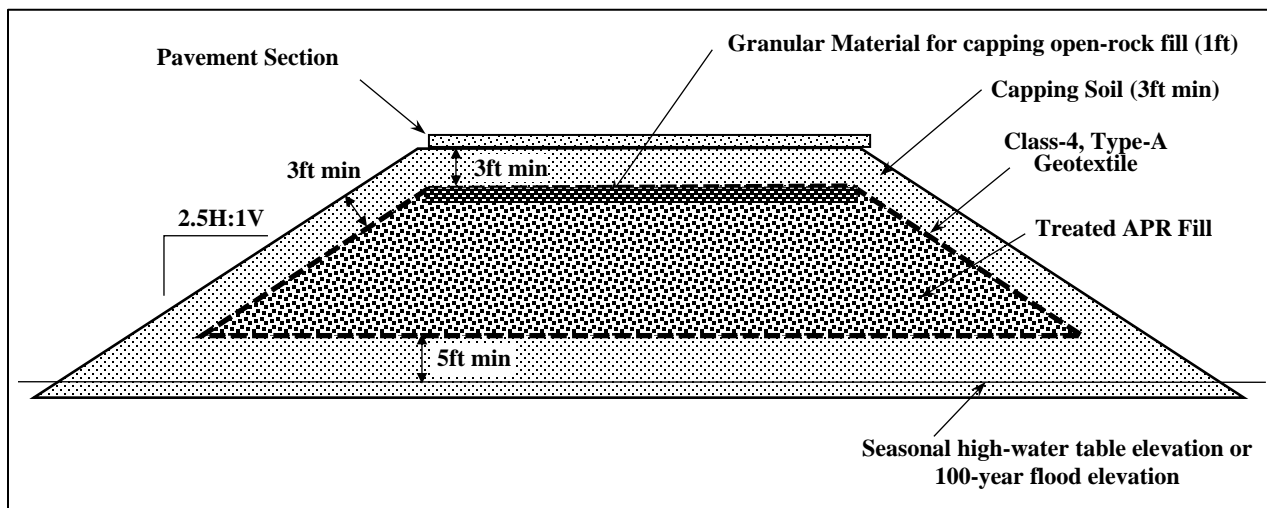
Typical Section: Minimum Requirements for Treated APR Fill
